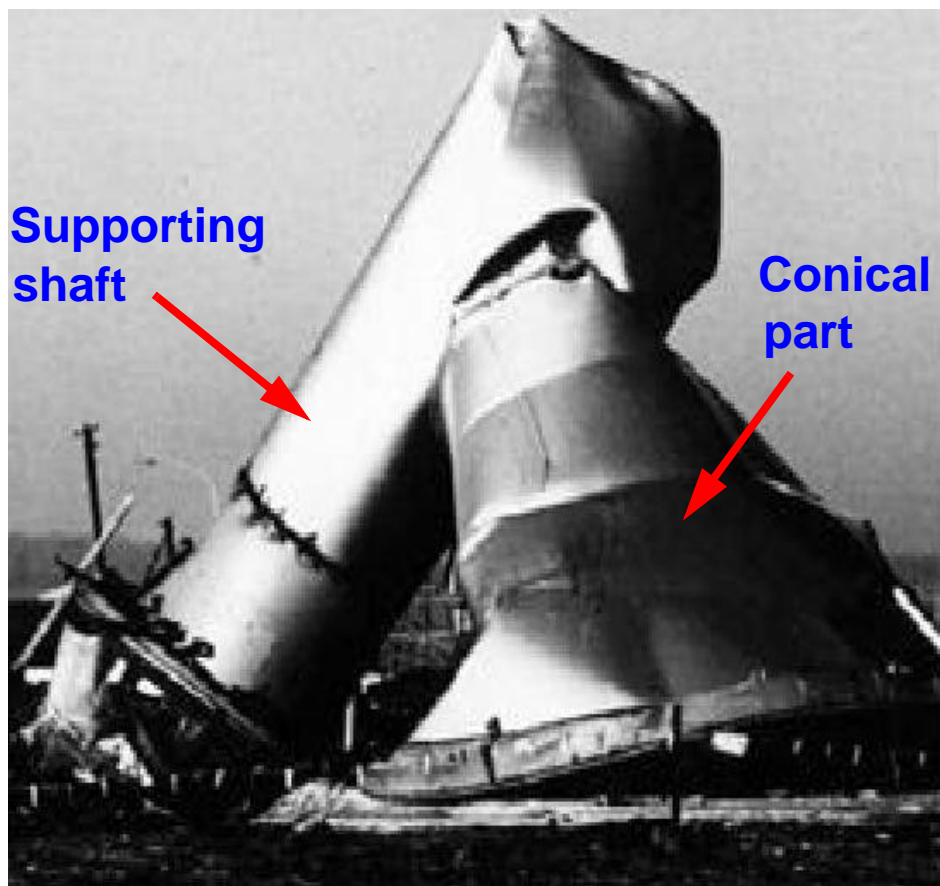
Collapsed steel water tower, 1972, Belgium
